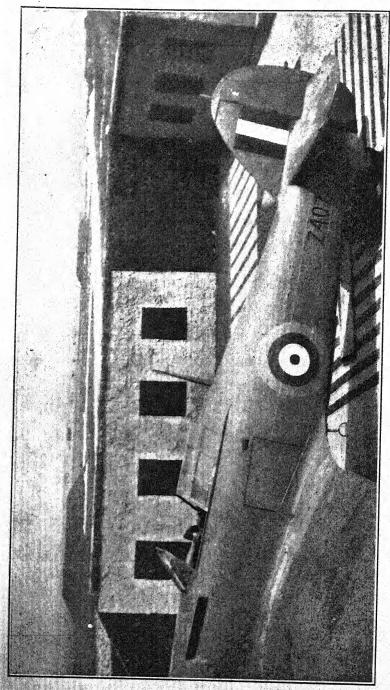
CAMOUFLAGED MASONRY PEN. PALESTINE
